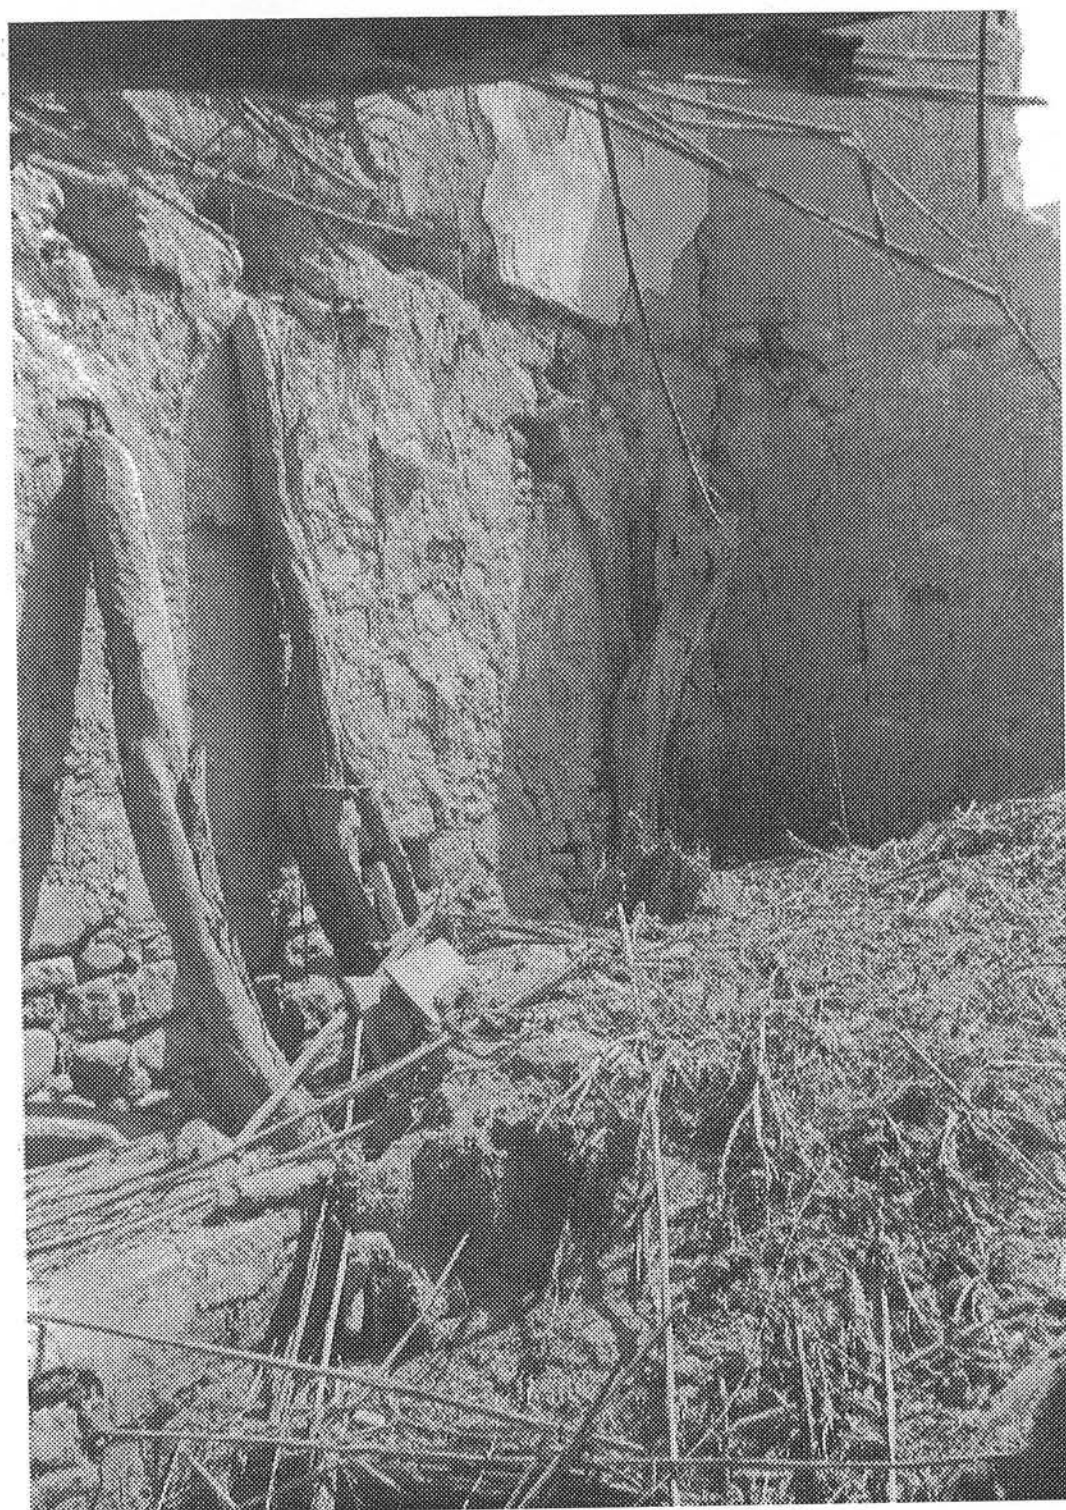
House 162/1, view of interior of ground floor showing pattern of roof and rafter collapse.
